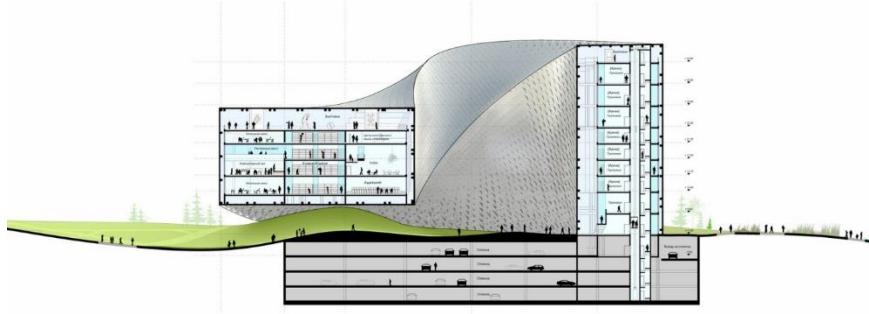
ANL section (source: <http://www.big.dk/#projects-anl>)
